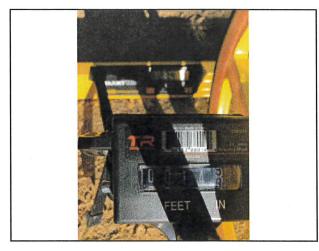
Private Access Rd APN 208-231-012 Slope 21.4% Width 14'9"
